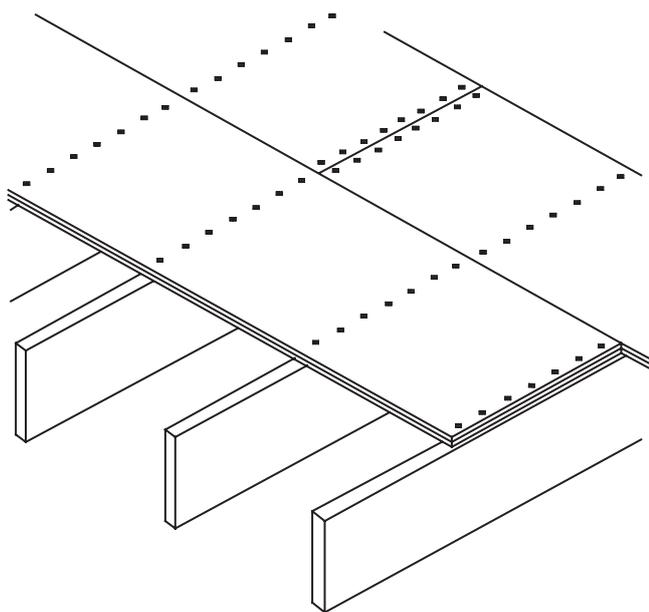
Tongued and grooved edge structural decking should be laid across the joists with short edges supported on joists
